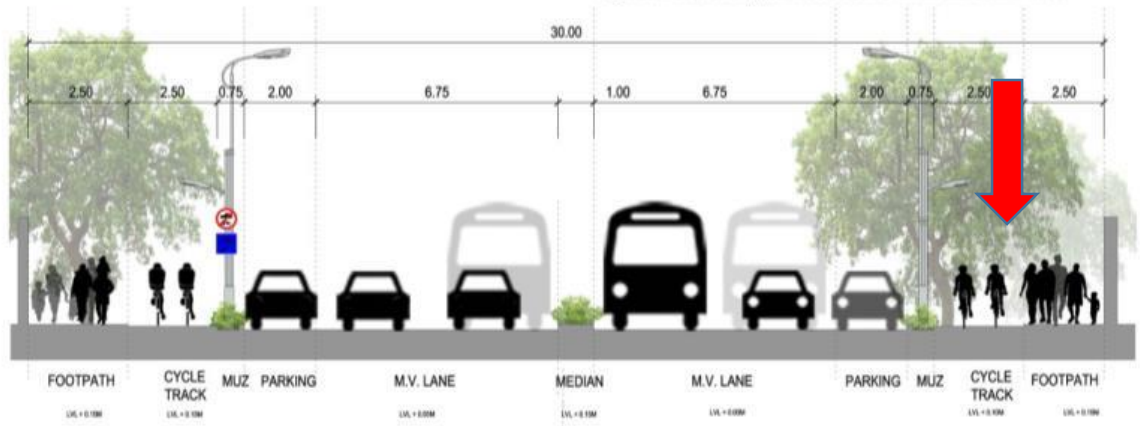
Proposed Typical Cross Section - Mahatma Gandhi Road
